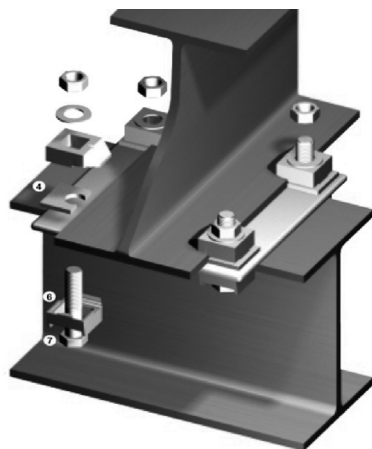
Girder clamps used to fix the new decking onto the existing load-bearing structure.
